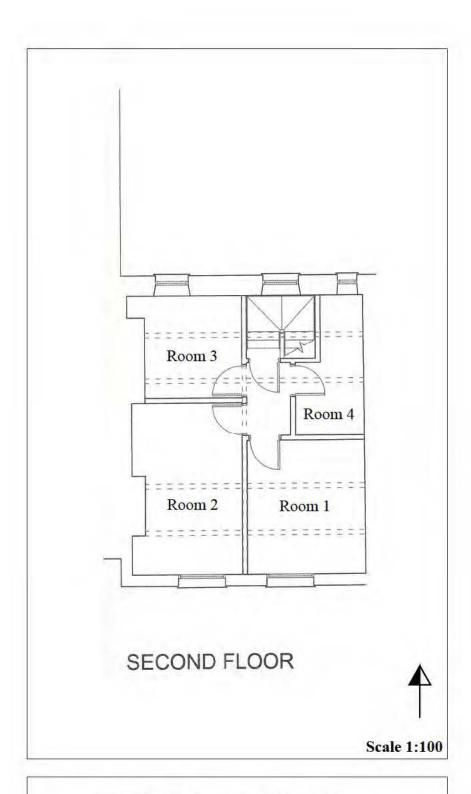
Architects Plan of 21 High Street Second Floor Level. Plan Supplied by Client
